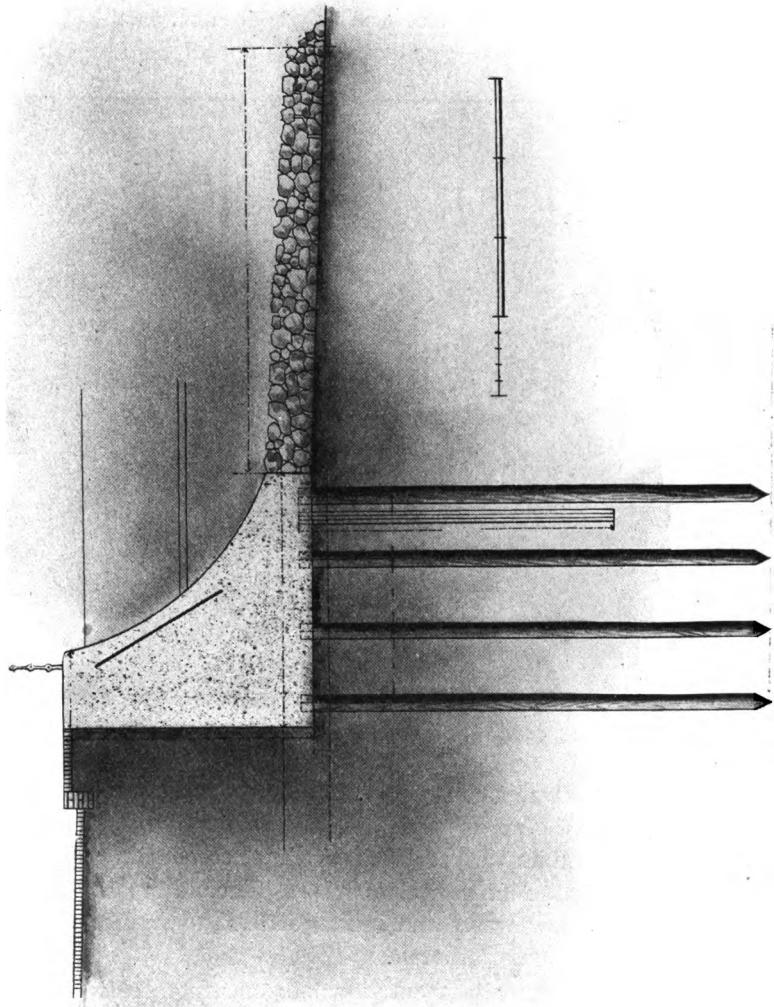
Sea Wall in Process of Construction at Galveston, Texas.
